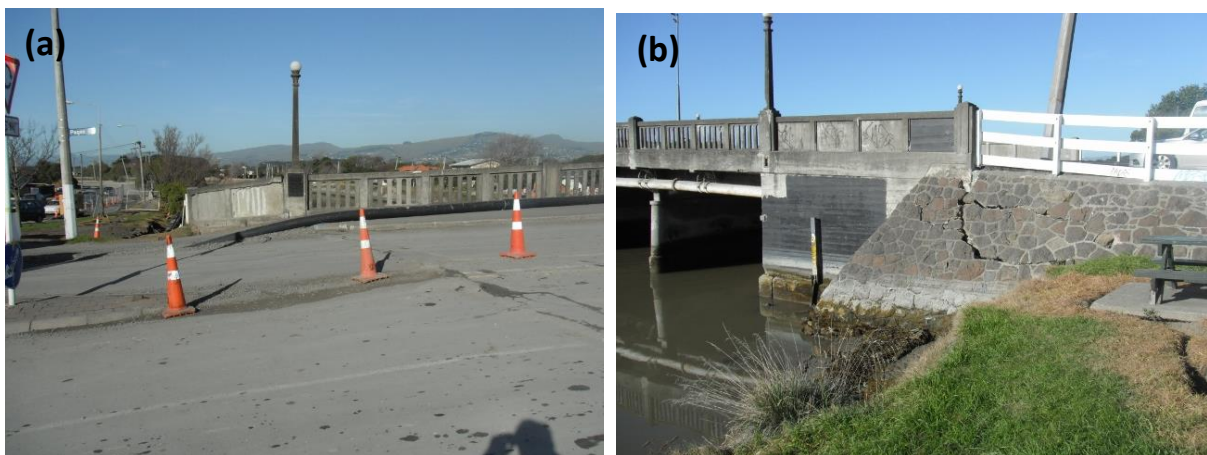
Pages Road Bridge, (a) east abutment approach settlement, (b) west abutment settlement and cracking through rock façade.
